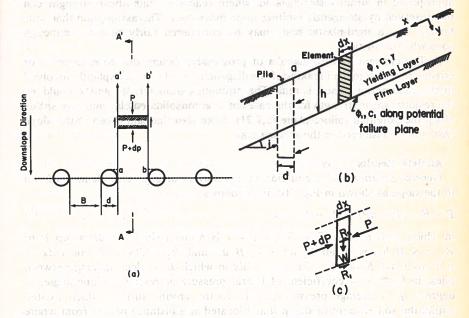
Plan View of Series of Piles: (a) on Slope; (b) Cross Section; (c) Generic
